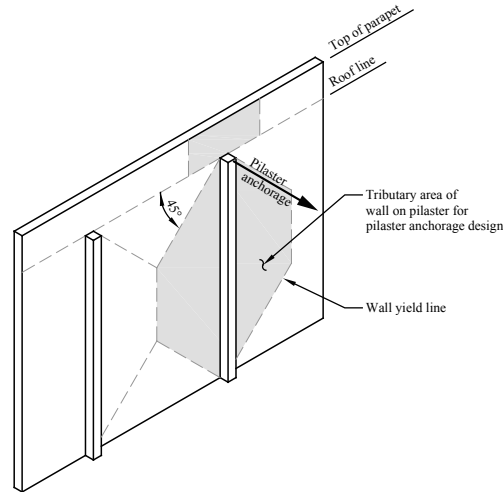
Tributary area used to determine anchorage force at pilaster.
